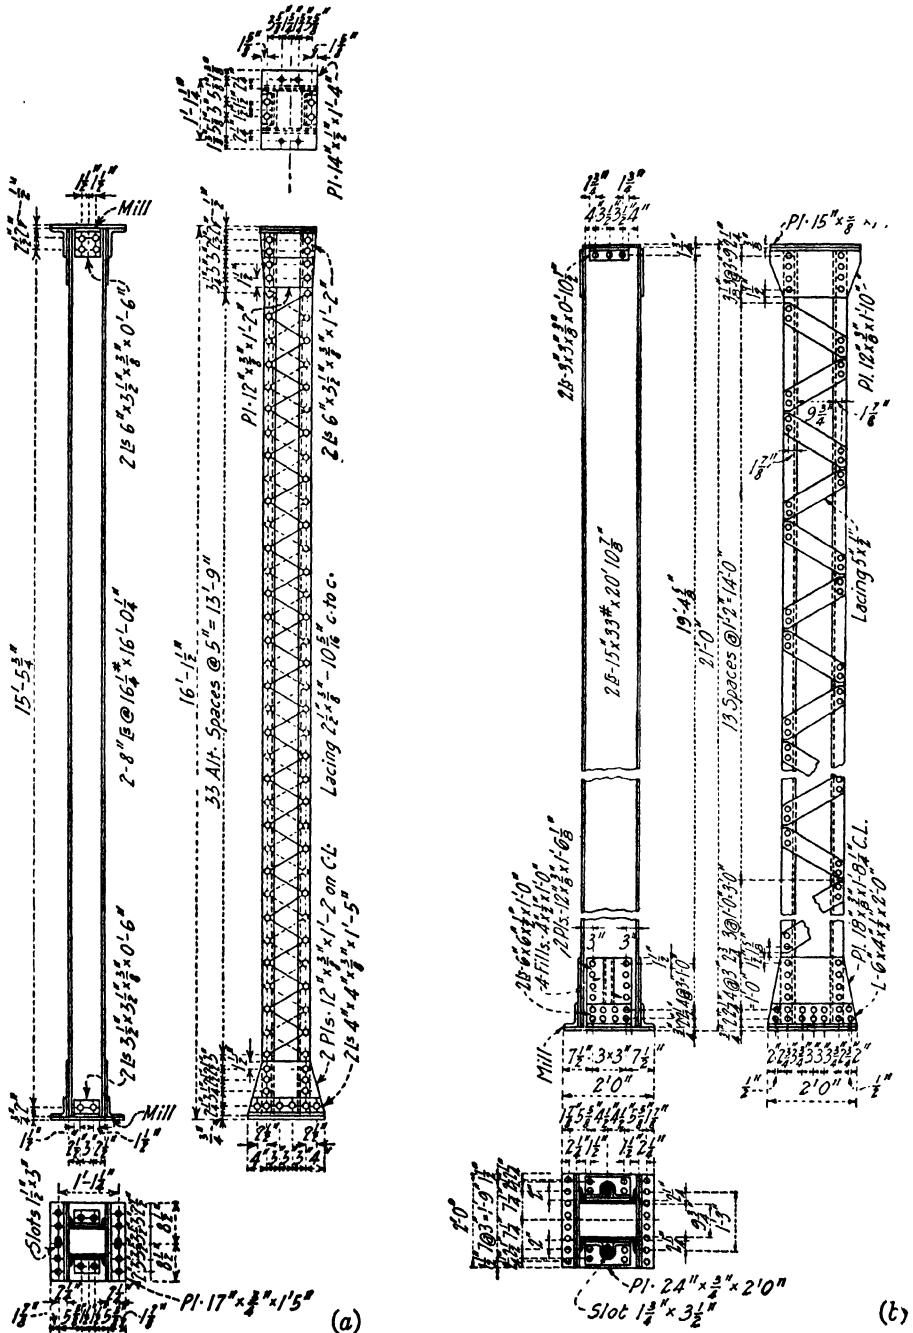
DETAILS OF MILL BUILDING COLUMNS.
